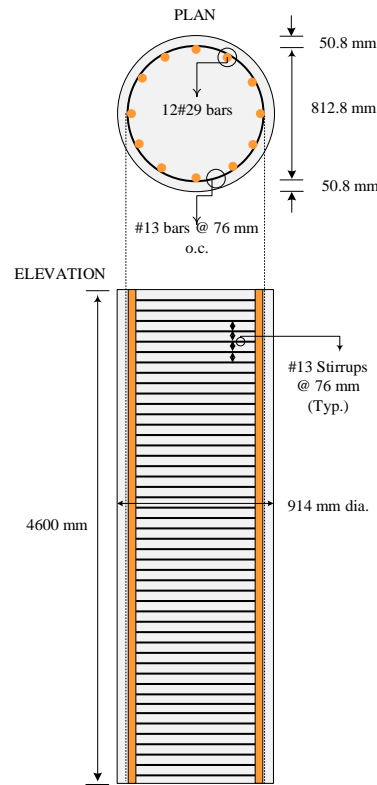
Cross-section and elevation view of the seismically designed reinforced concrete bridge column
